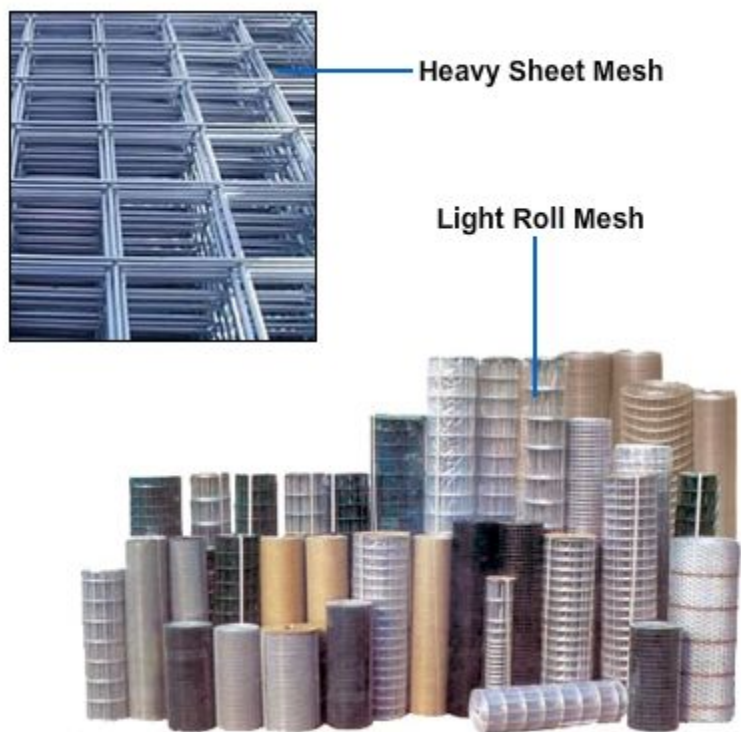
Welded wire fabric reinforcement.
